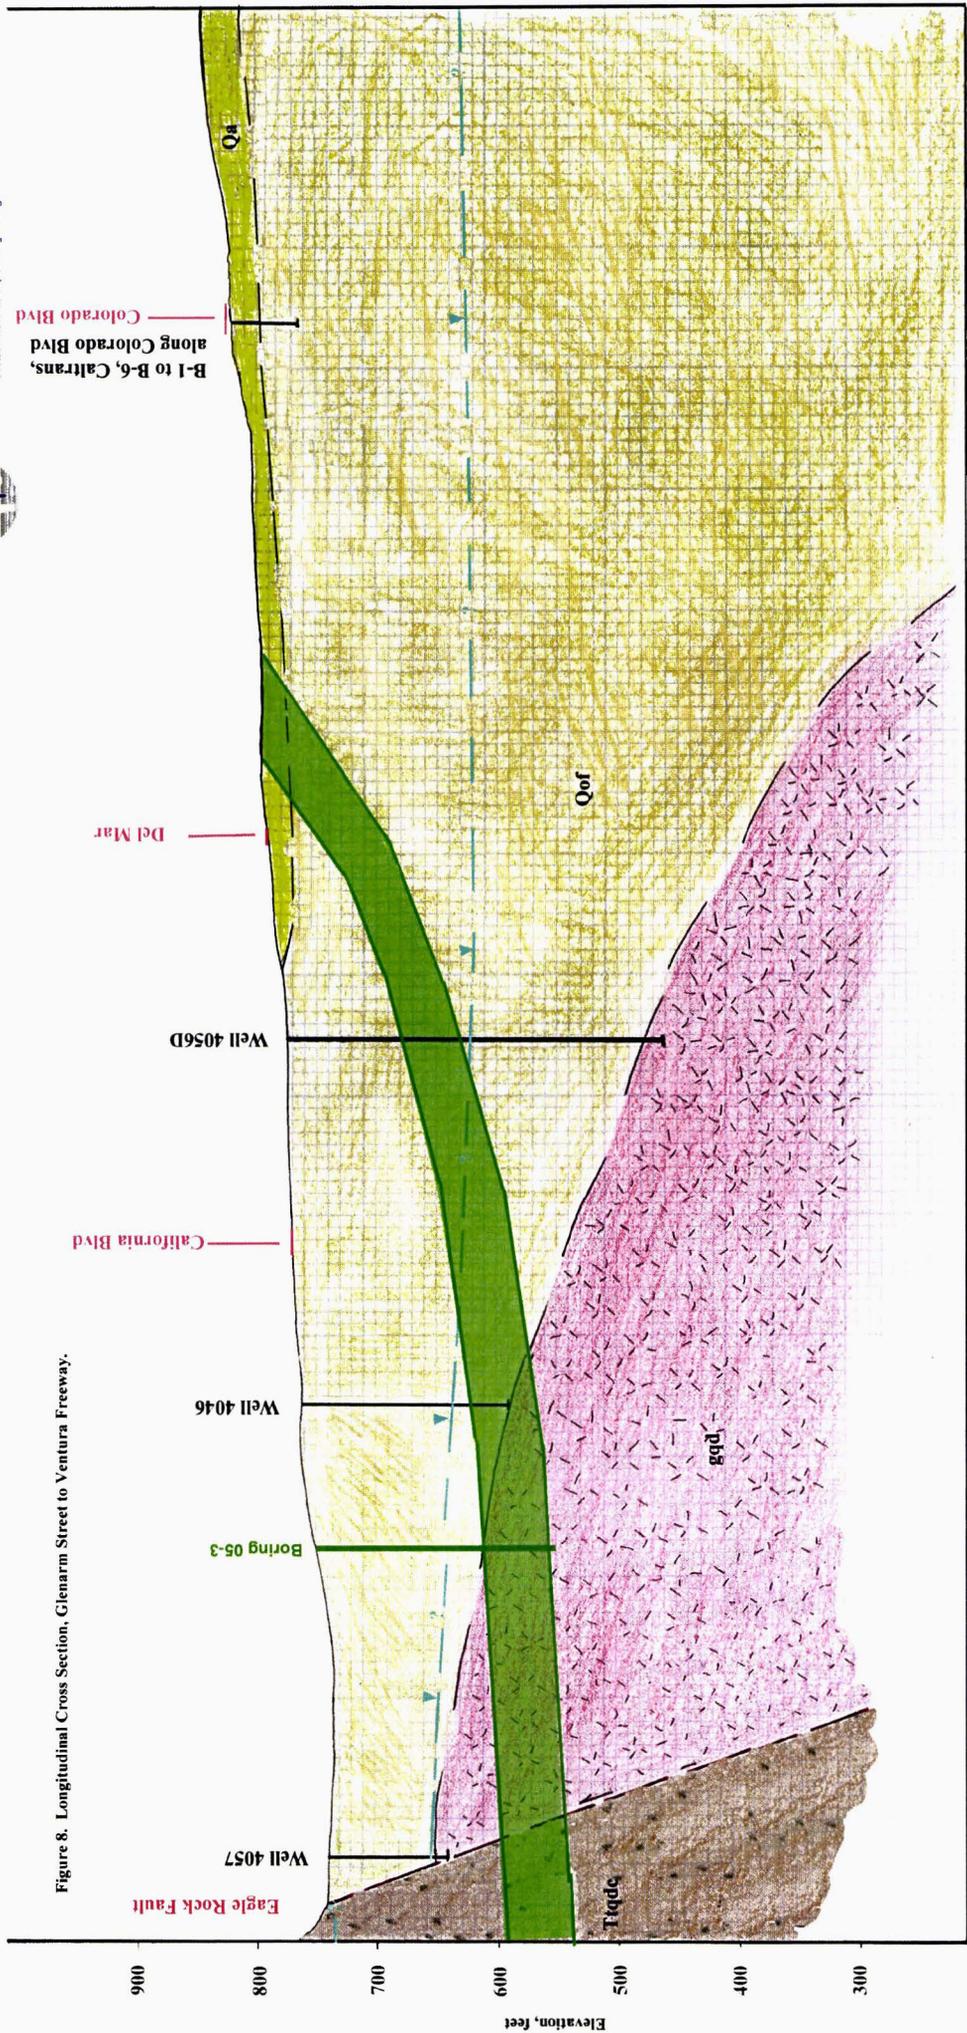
Longitudinal Cross Section, Glenarm Street to Ventura Freeway.
